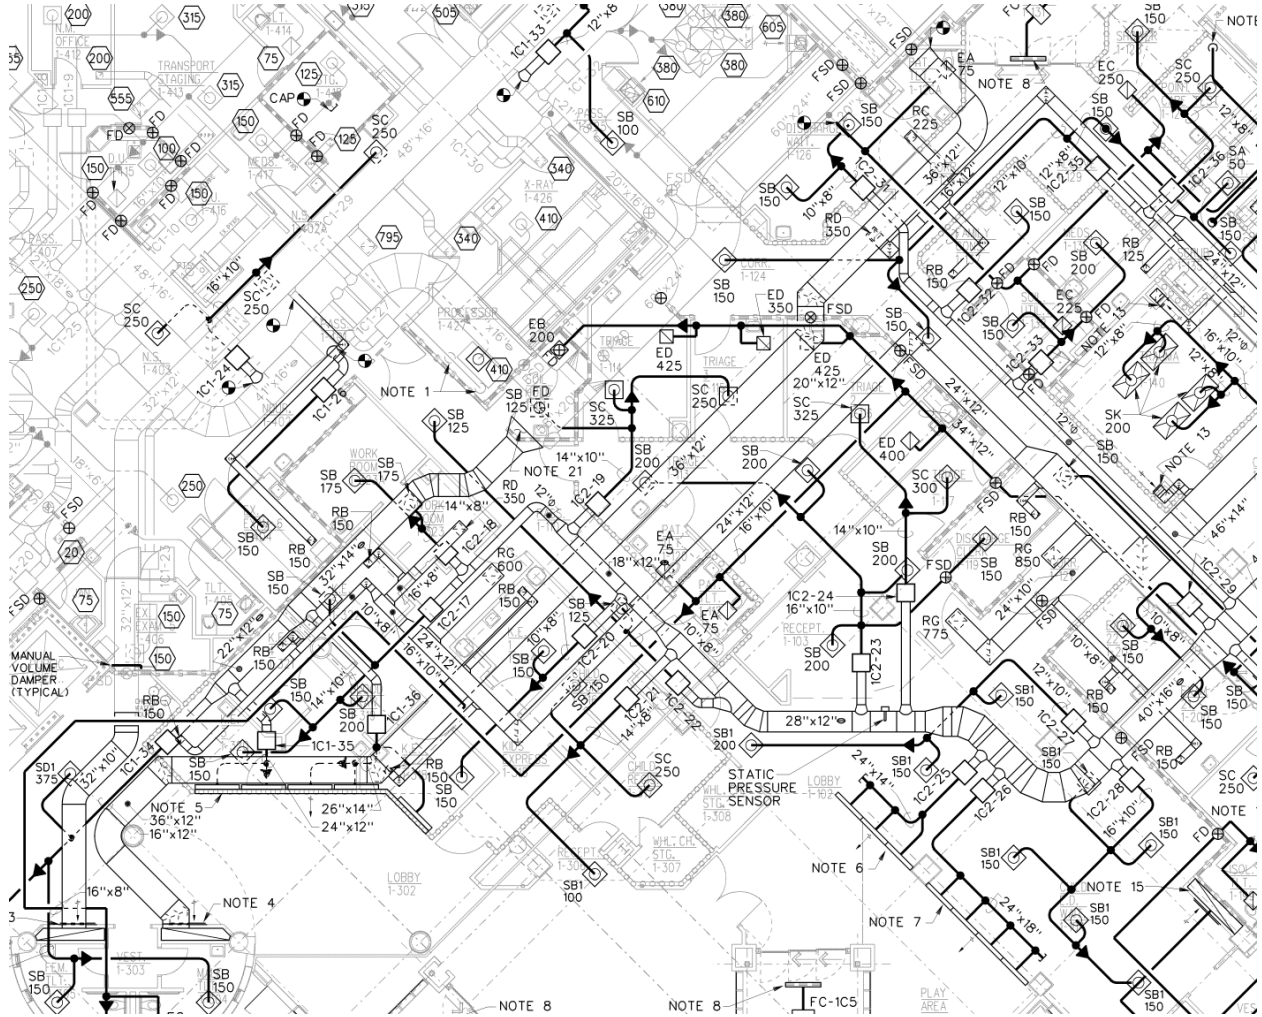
HVAC systems extend throughout large buildings. Pictured above is a small section of a floor plan.
